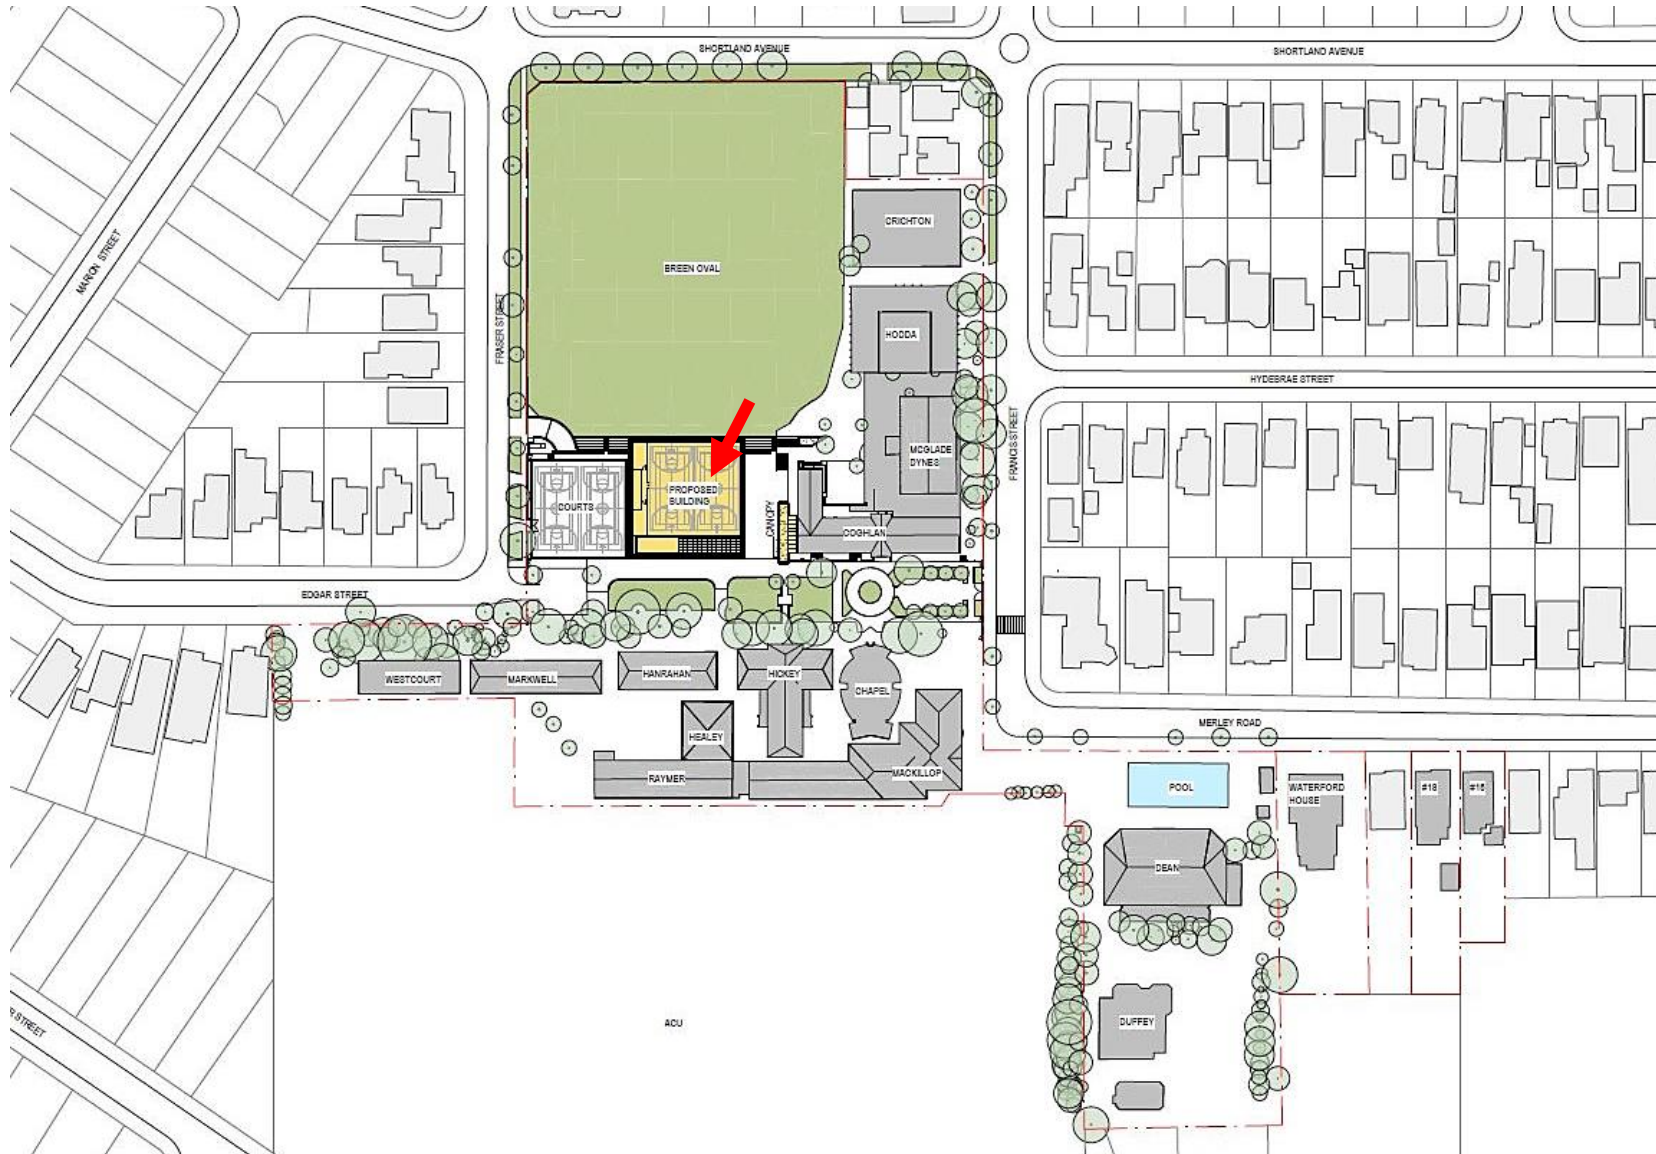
Proposed Site Plan. Location of proposal indicated with arrow.
